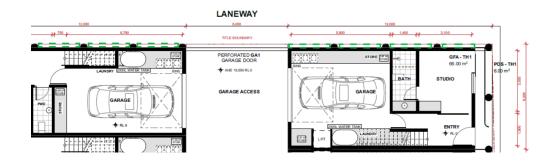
Dashed green line - potential greenery addition proposal (indicative). Not to scale.
